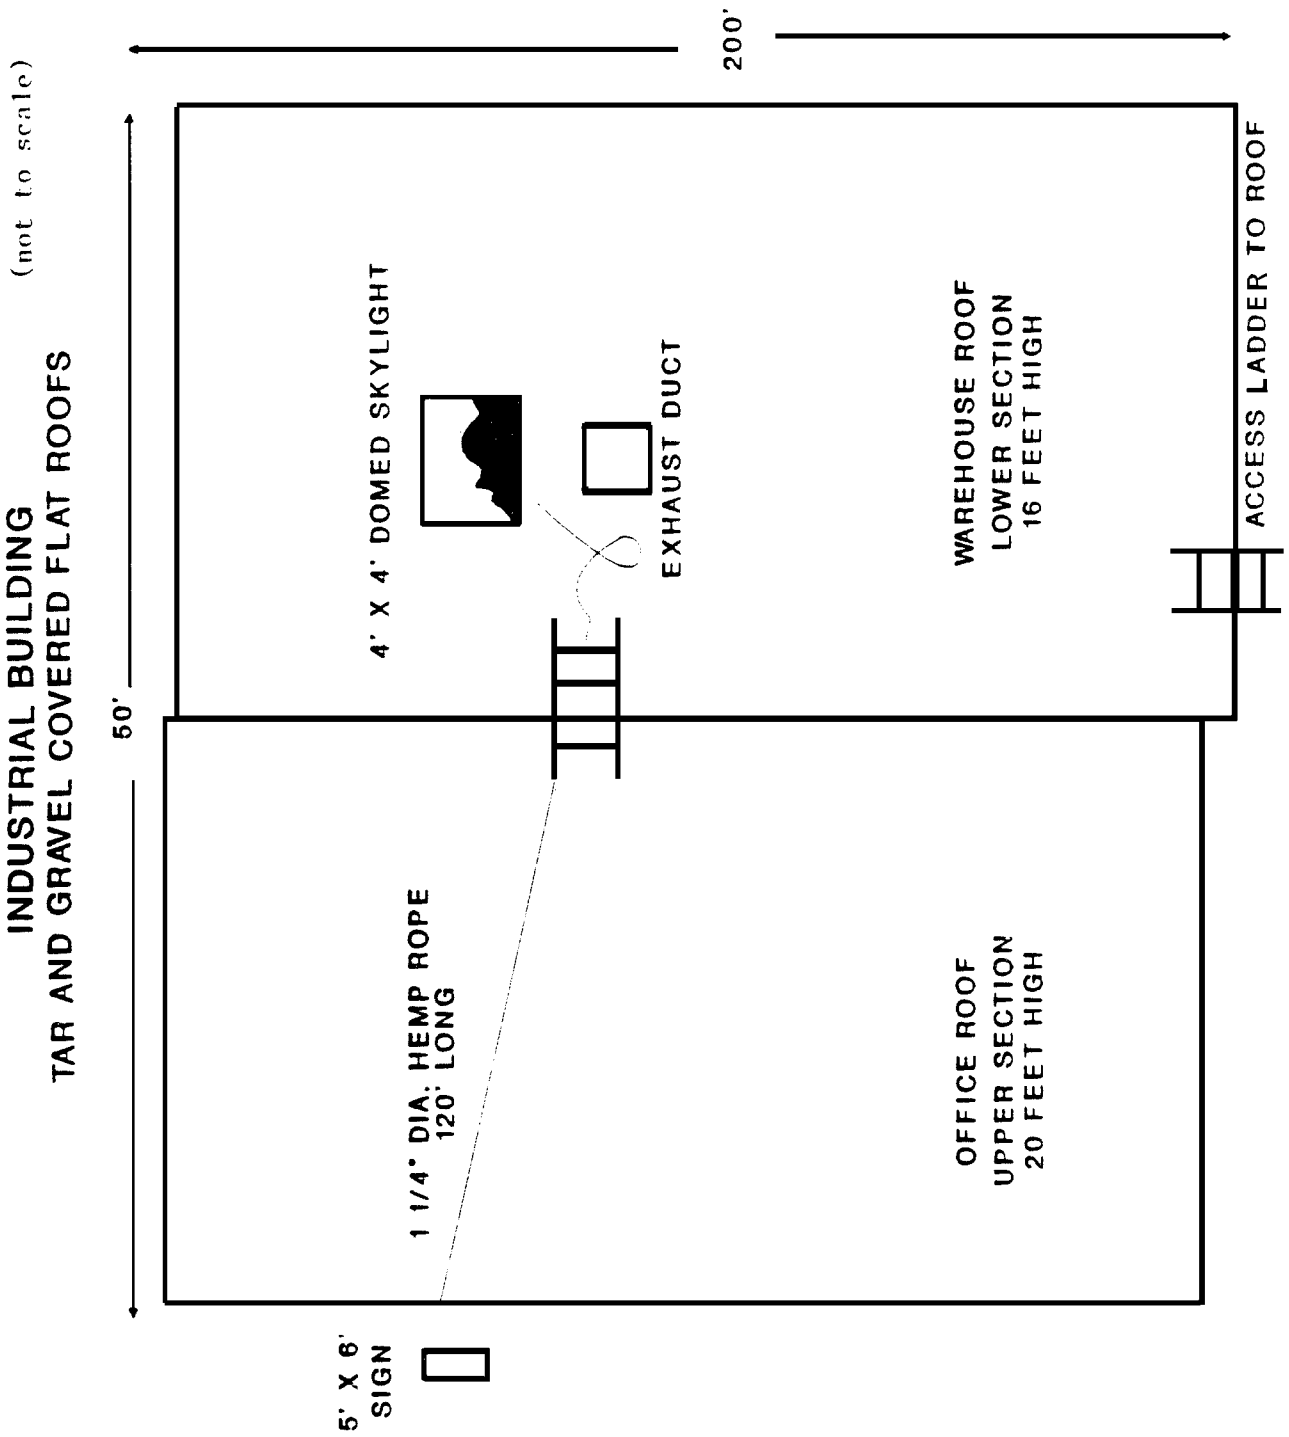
A Diagram Showing the Roof Area of the Industrial Building
